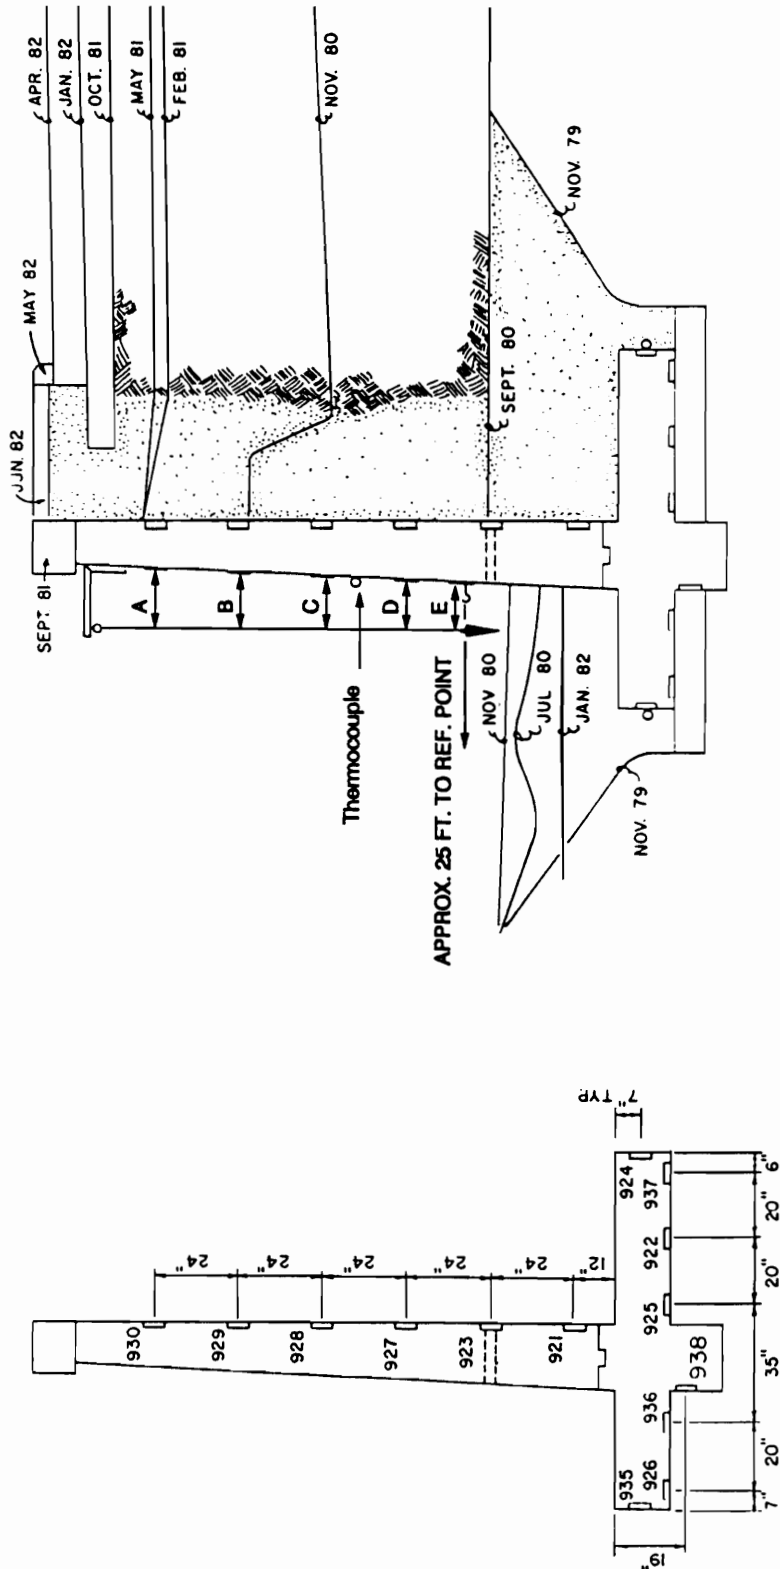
Wall Dimensions, Instrument Locations, Backfill Zoning, and Construction Sequence, Cantilever Retaining Wall, State Highway 288, Houston, Texas (Bruner, et al., 1983).
